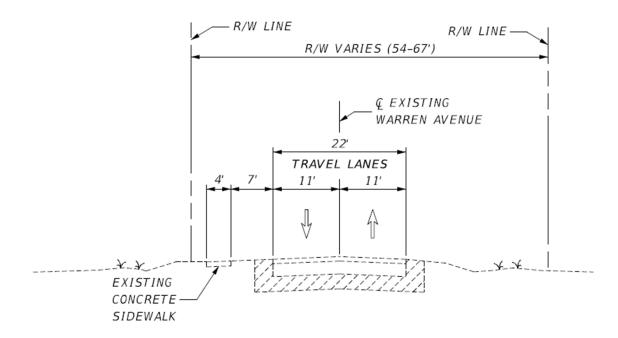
Existing Typical Section from 140 ft West of Lemon Lane to 320 ft East of Lemon Lane
